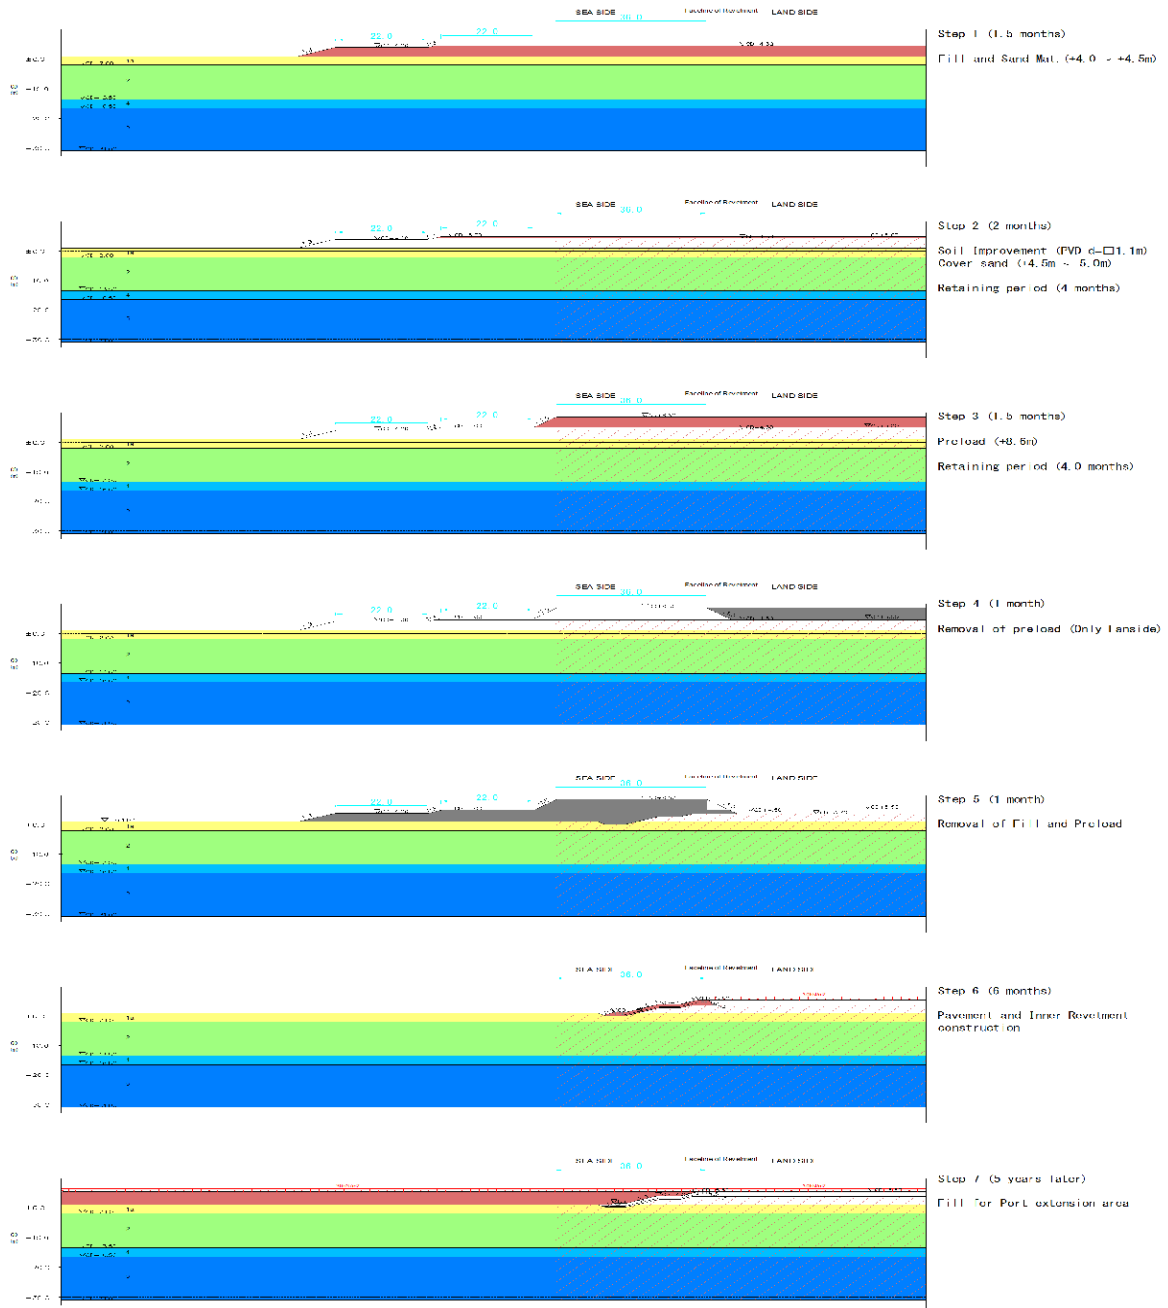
Analysis Steps based on assumed Construction Schedule for Section FEM-2 at Inner Revetment beside Full Container Storage Yard
